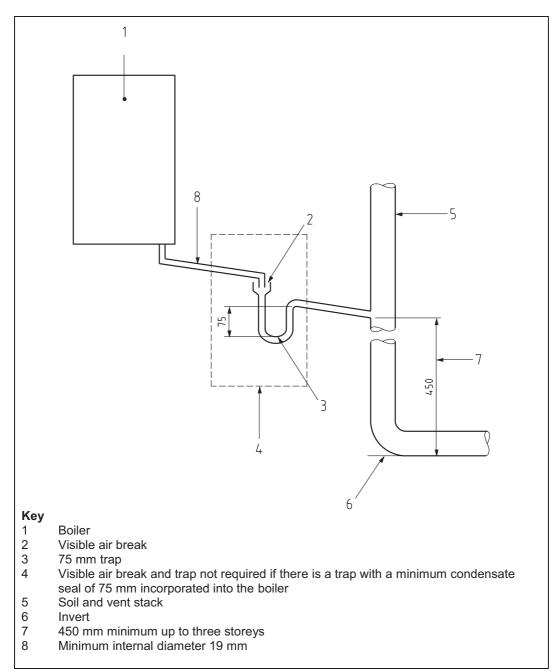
Connection of condensate drainage pipe to internal soil and vent stack
